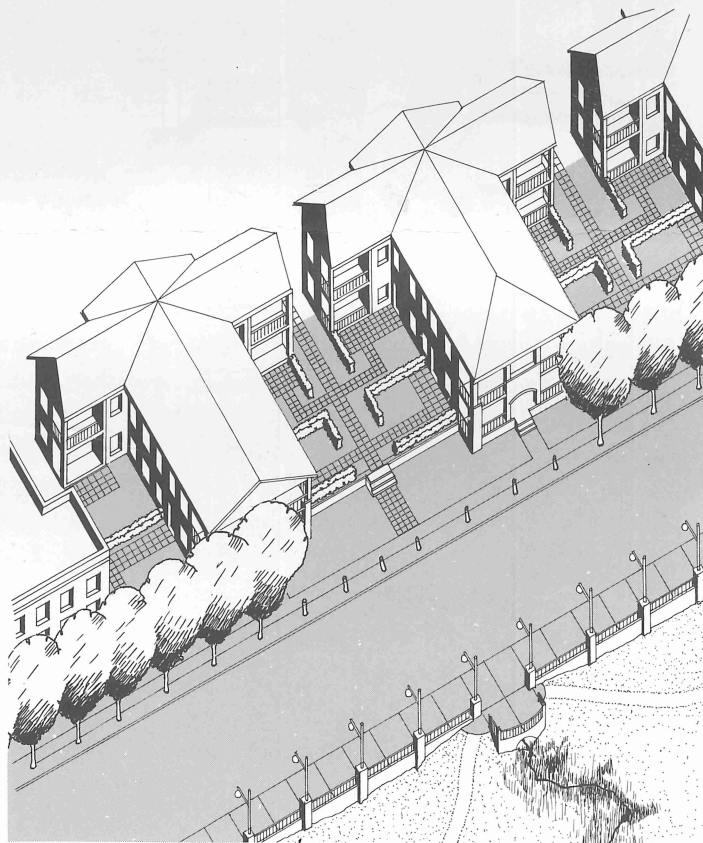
Park Overlook Apartments provide semi-private side yards and varied street facades.
